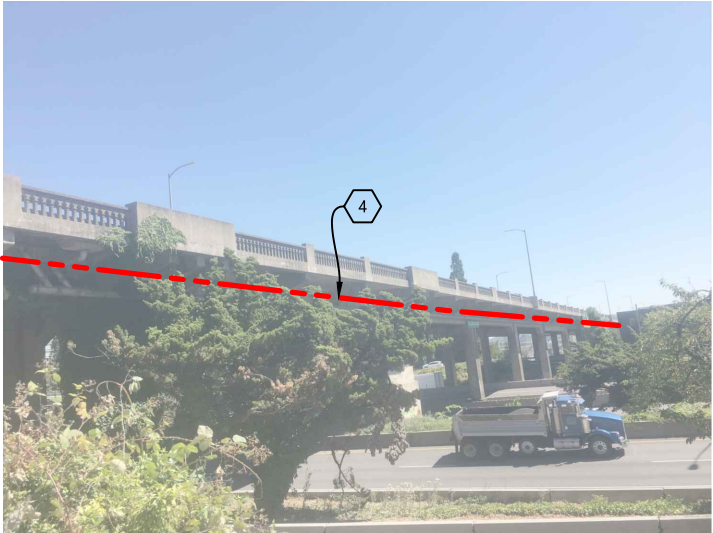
FACING EAST ON SOUTH SIDE OF ROSS ISLAND BRIDGE
